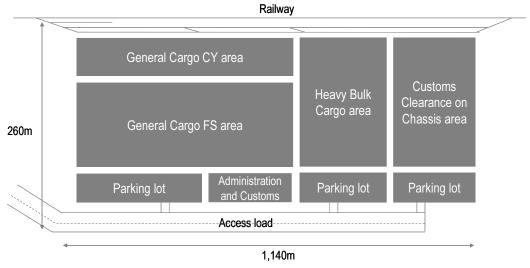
Layout Plan of VLP (Alternative A-1)
